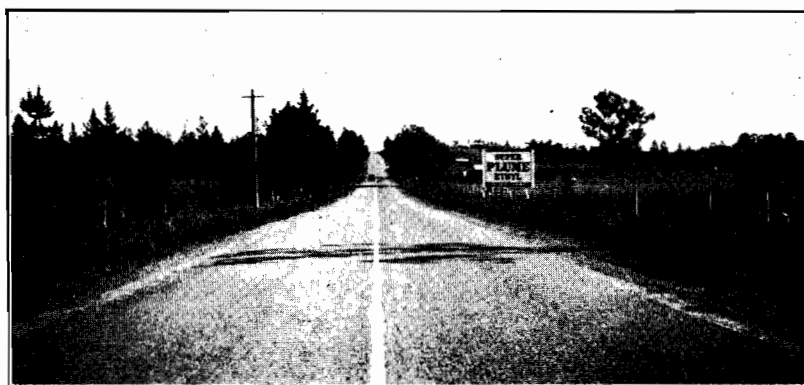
Showing reconstructed section of the Burwood Road in the Shire of Blackburn and Mitcham.
